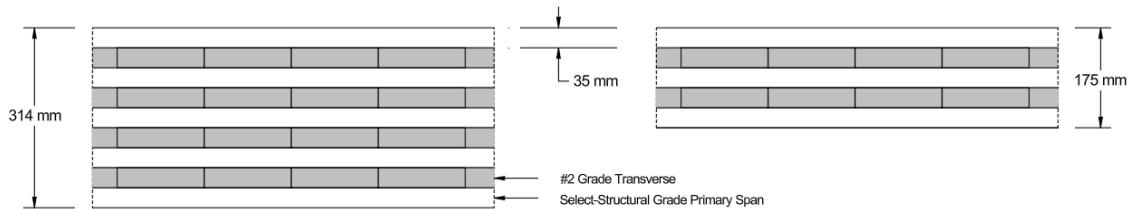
Layup of Longitudinal (left) and Transverse CLT Panels (right)
